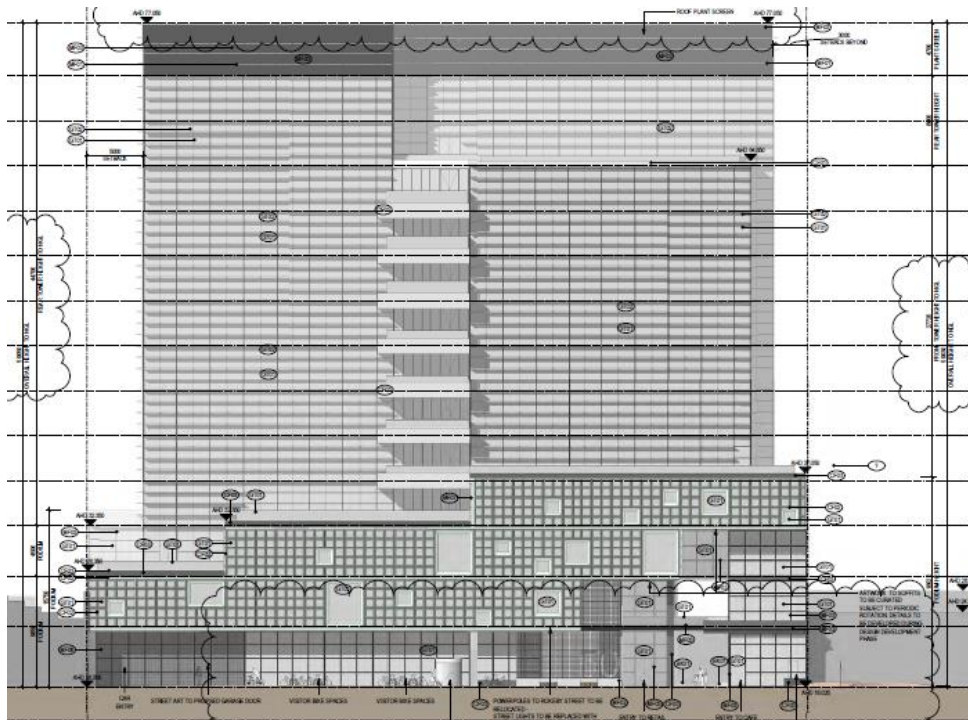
Rokeby Street elevation (West Elevation) – Amended Plans
